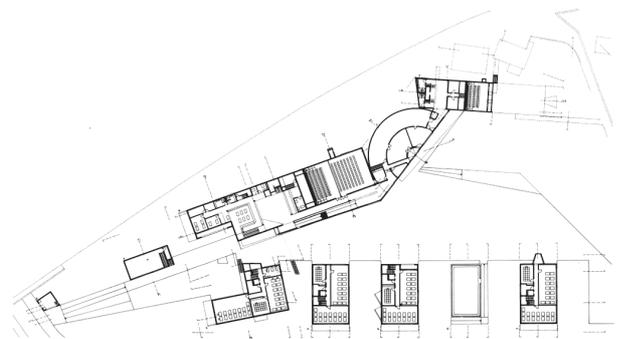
School of Architecture plan. Tower H in on the right lower corner, with studios on the south and east.
